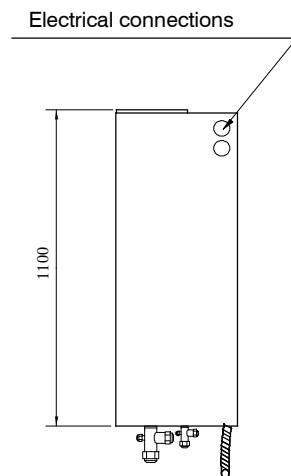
Evaporating unit SE 08–10–13–14W (version without freecooling)
